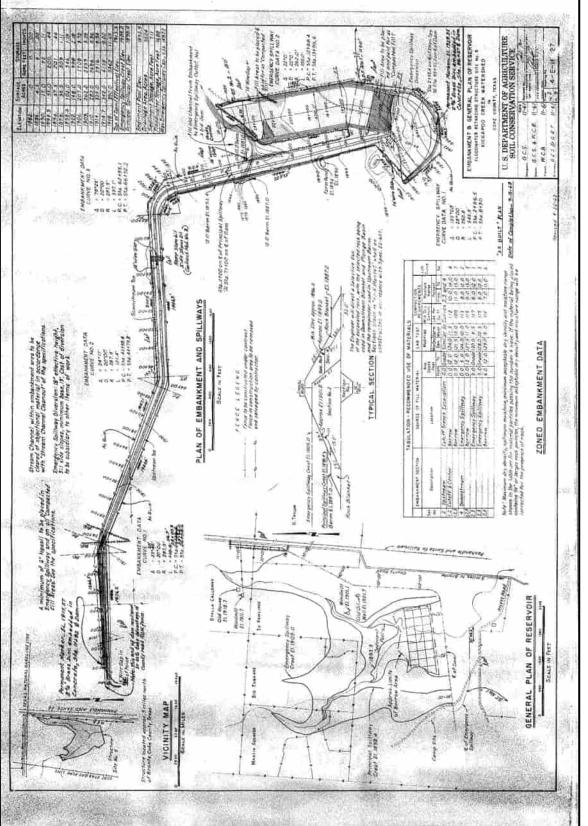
As-built plan of dam complex at Kickapoo Creek Watershed FRS No. 5 (SCS 1963)
